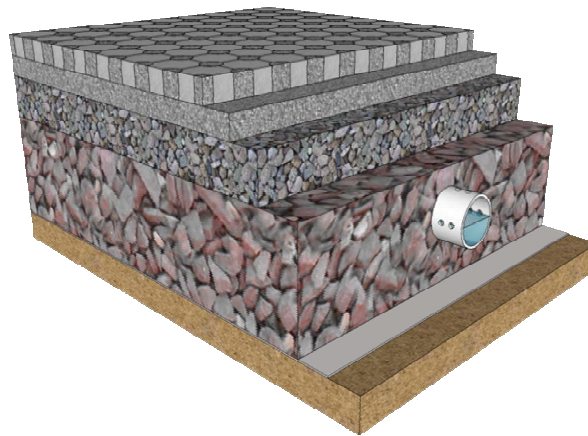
Schematic cross section of Permeable Interlocking Concrete Pavers (PICP) type permeable pavement
